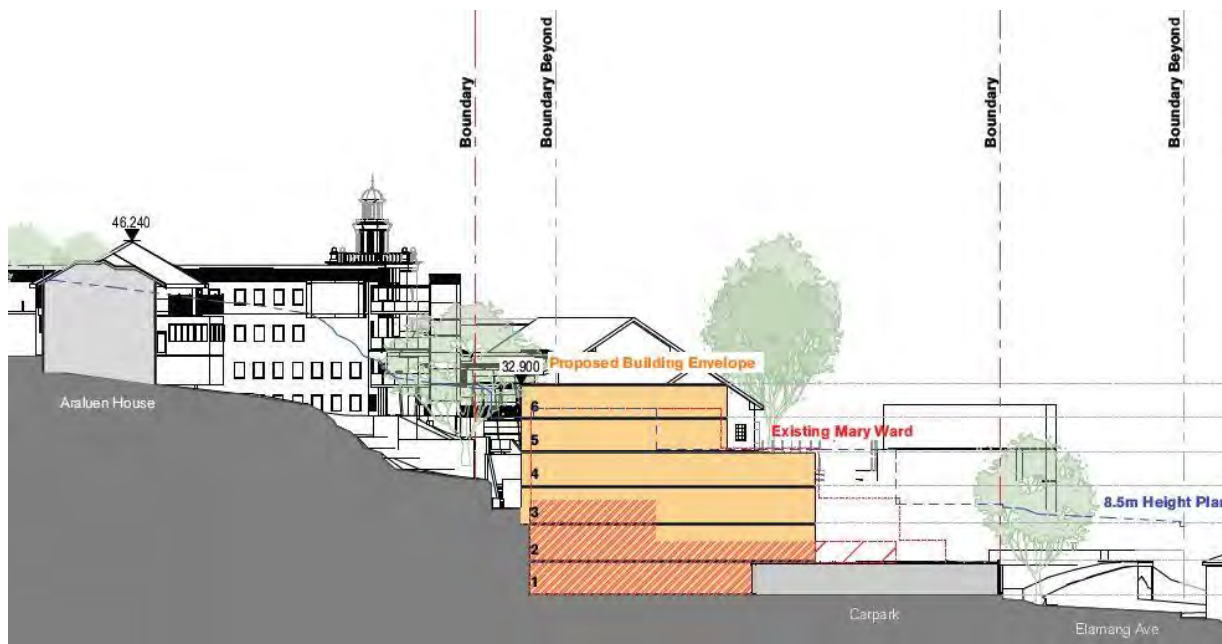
Section showing the massing of the proposed new building (Shaded orange) with the outline of the existing form of the existing Mary Ward, Music and Performing Arts buildings outlined in red dotted lines. The proposed new building will step back from Elamang Avenue to a greater extent than the existing building, which will have a positive impact on Vandua. (Source: fjmt drawing Mp-4001)
